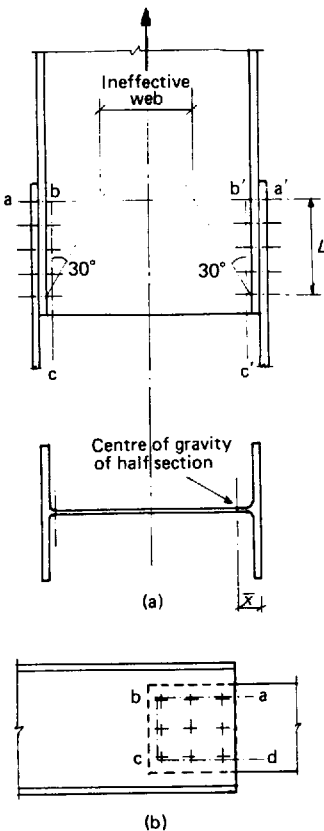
Partial connections of tension members (a) to flanges and (b) to web
